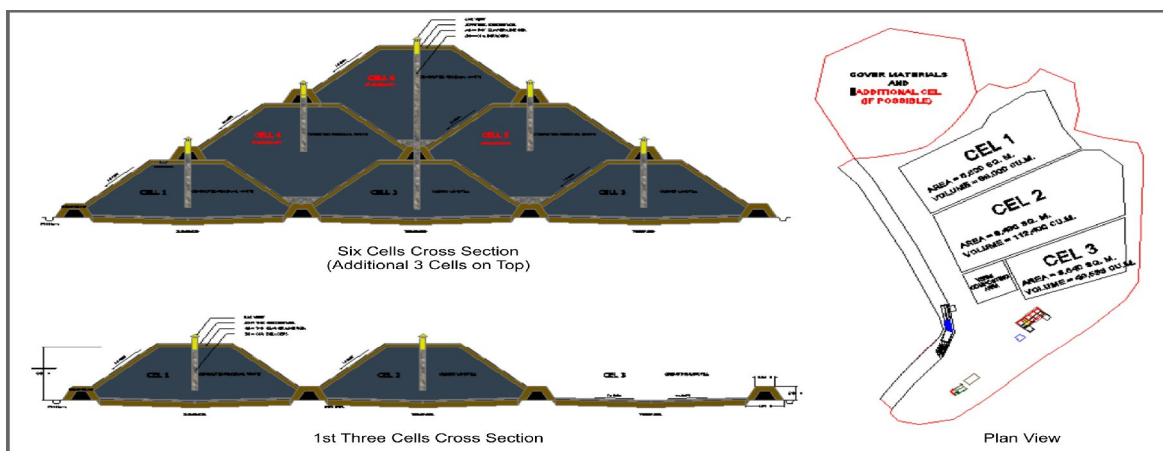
Sanitary Landfill Plan and Cross Section
